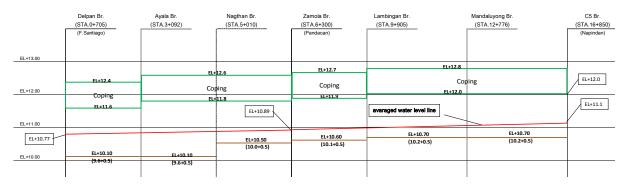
Design elevation of Coping Concrete and Riprap
